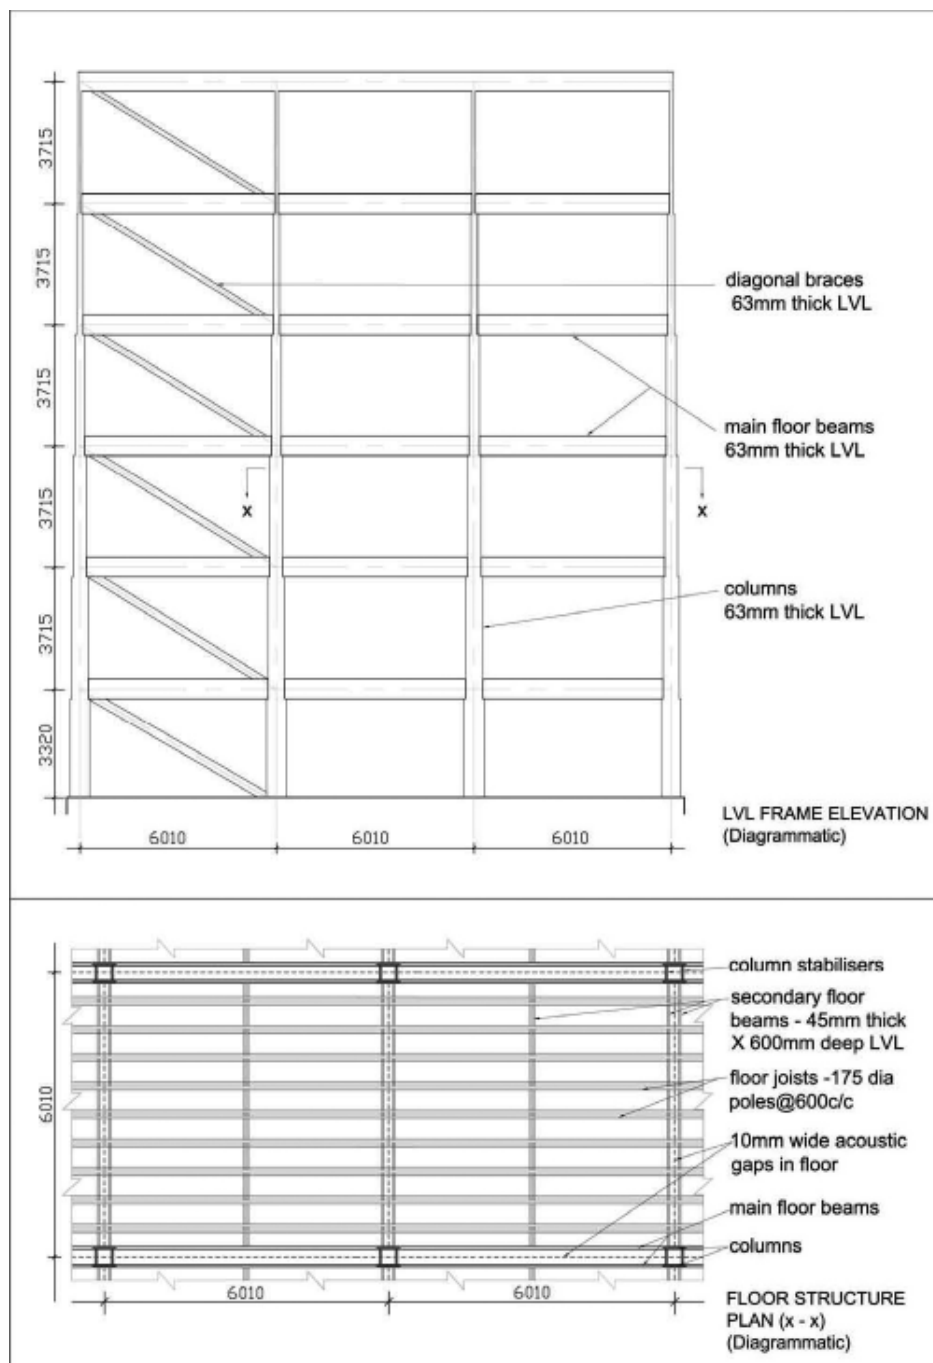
Proposed Structure System for 6 Storey Timber Commercial Building
